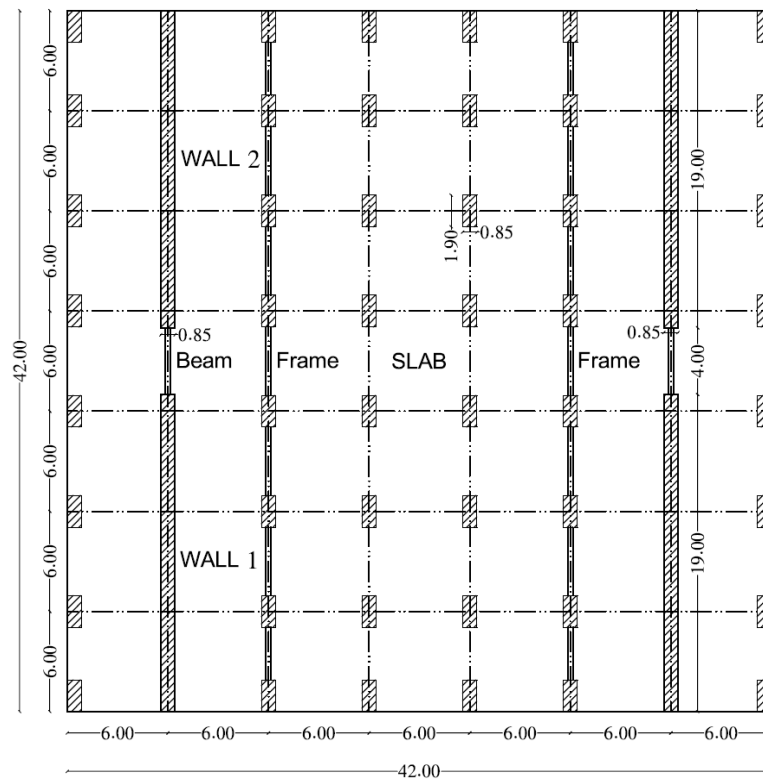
Typical structural plan of buildings in group (2) with Frame.
